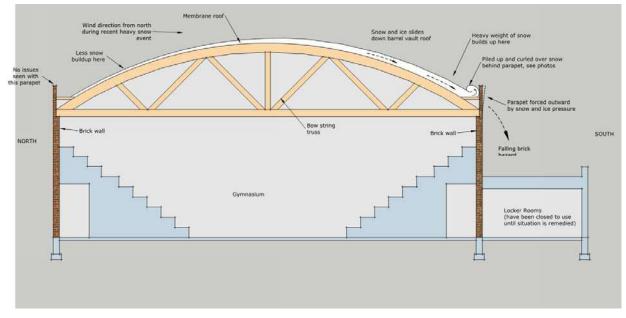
Building section showing Paradigm's opinions regarding cause of outward bowing of south parapet wall (Paradigm 2018)
